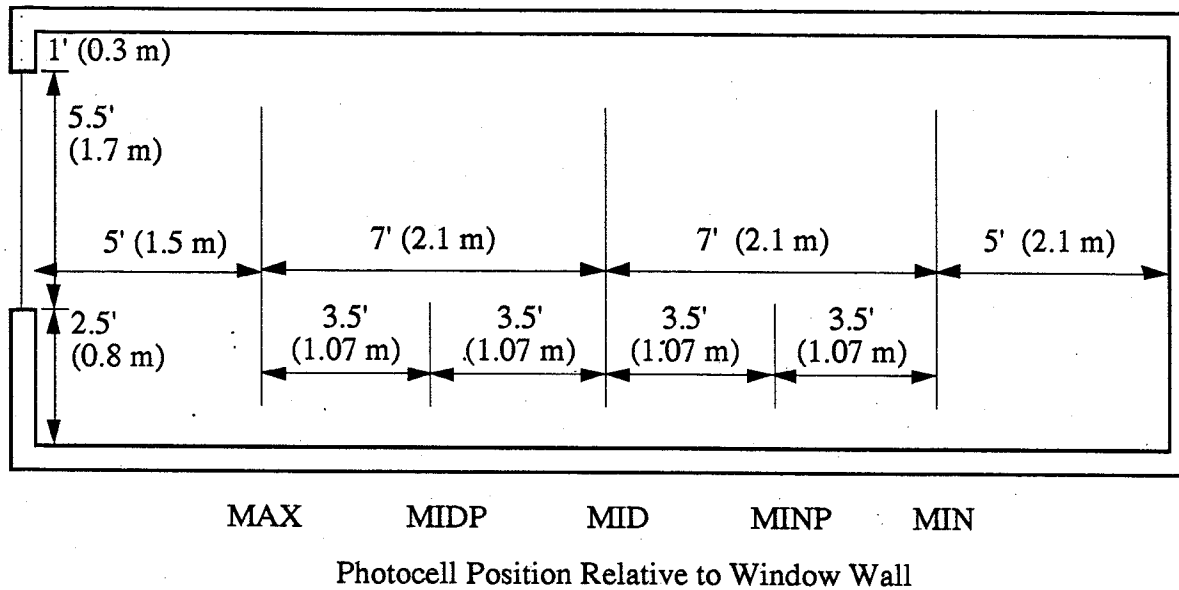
Section of the test space, showing the placement of the sensors between the window and the rear wall.
